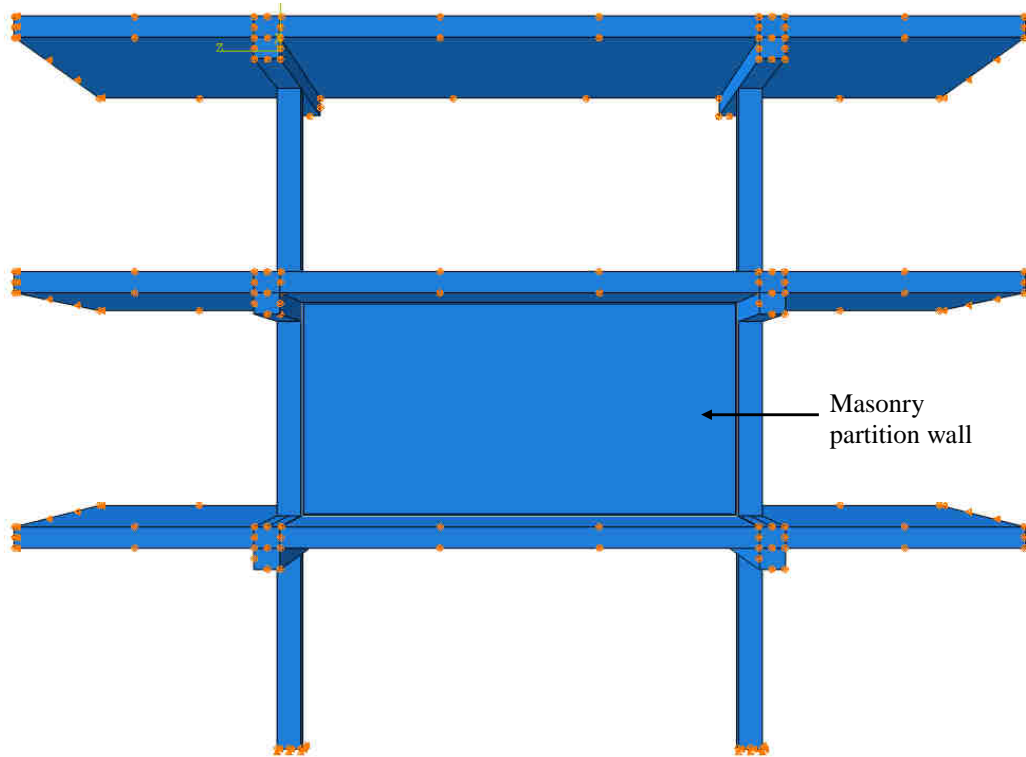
Symmetry conditions for the geometrical model used for the simulation of the concrete structure filled with a masonry partition wall
